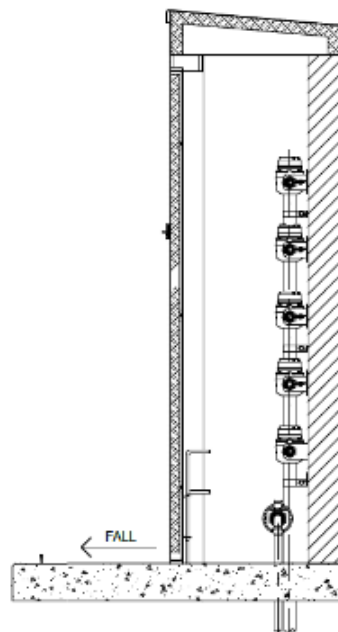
Typical Sub-Meter cabinet assembly – Side view
